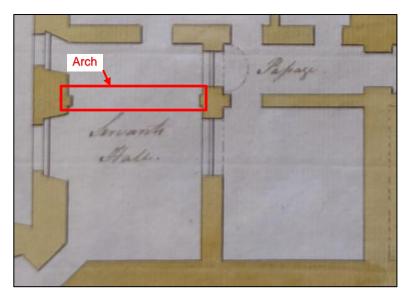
Extract from the 1780s plan of the building, first floor of Cell G
